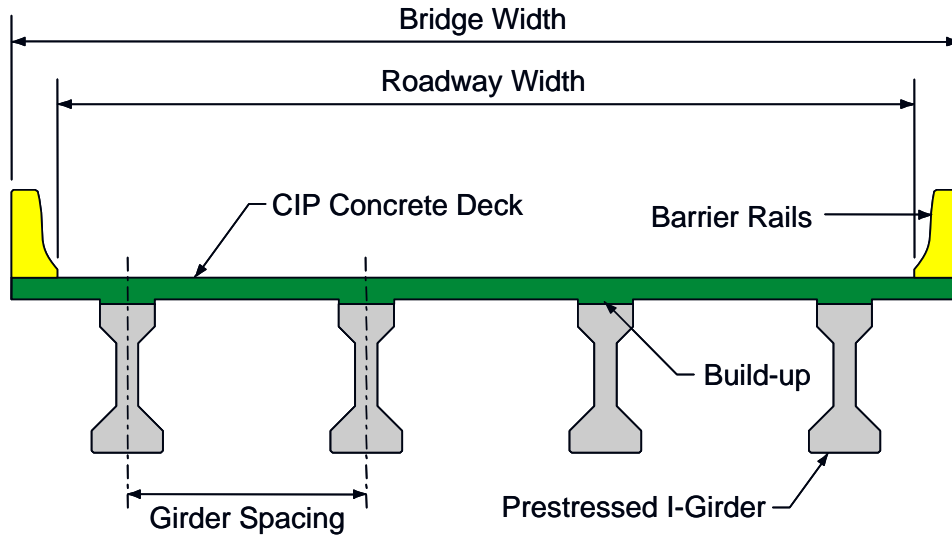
Typical Prestressed Concrete Girder Bridge Deck
